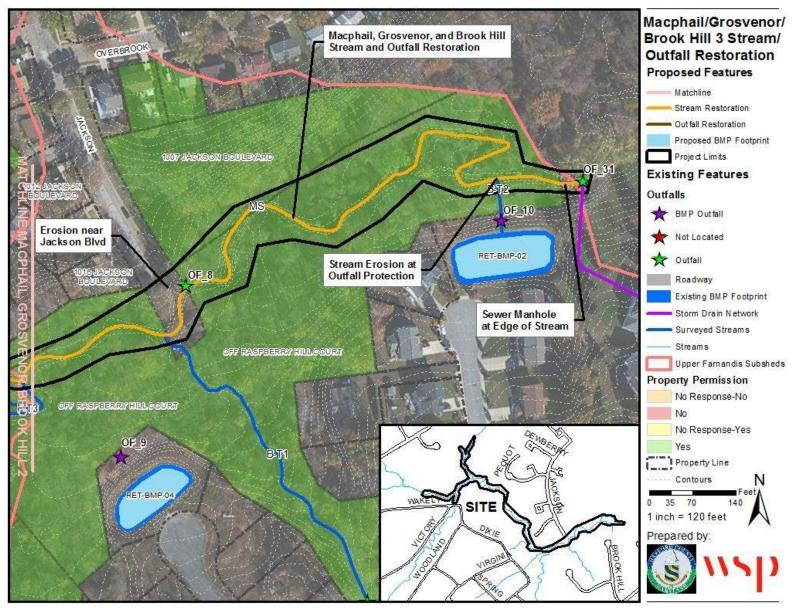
Site Location and Proposed Project Plan for Grosvenor and Brook Hill Stream and Outfall Restoration (Sheet 3 of 3)
